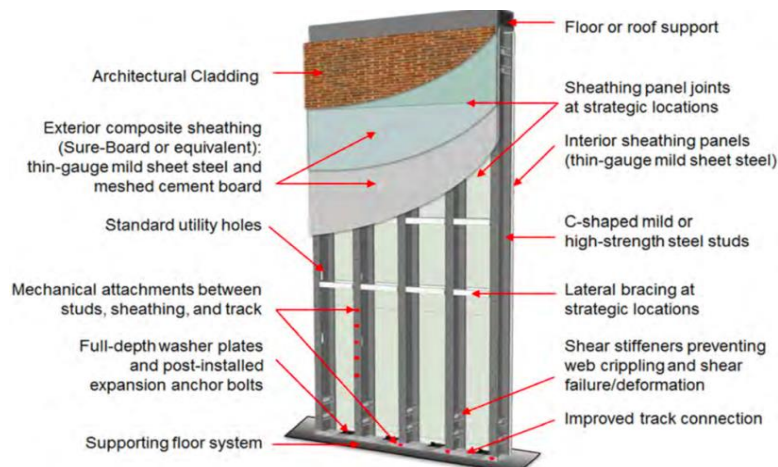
Section view of Steel Girts (adapted from Aviram (2014)).
